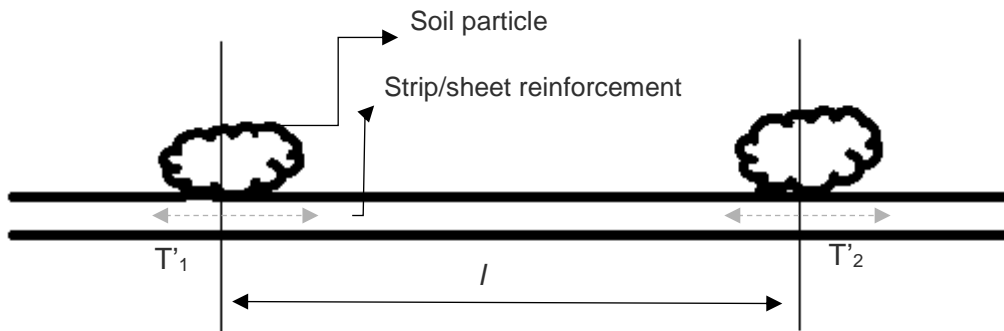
Adhesion development on strip/sheet reinforcement adapted from Jones (1996)
